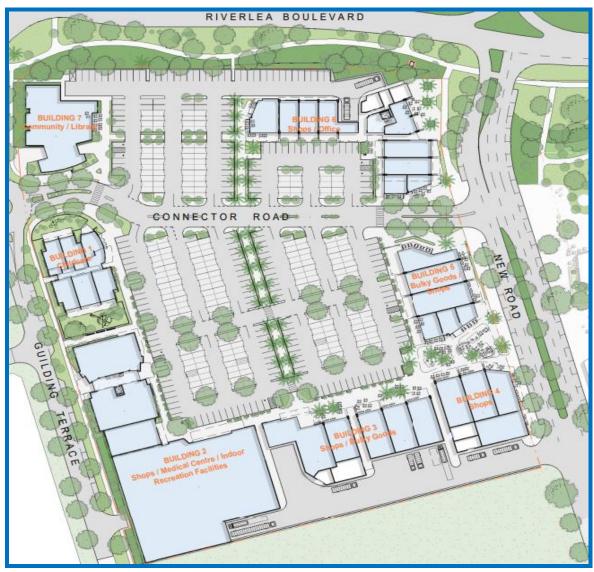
The Palms Village Stage 1 Retail – Riverlea (Site Plan – Ground-Level)
